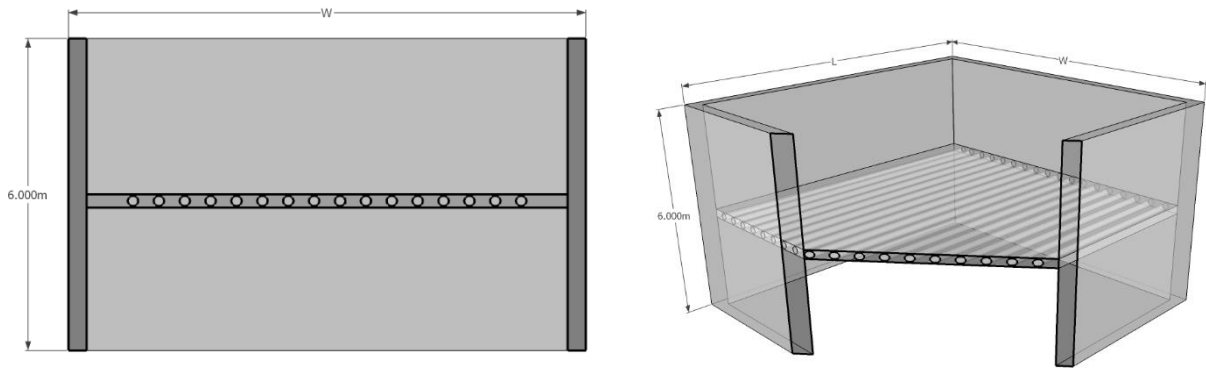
Section view of multi-dimensional slab and wall joint model: (a) 2-D and (b) 3-D model
